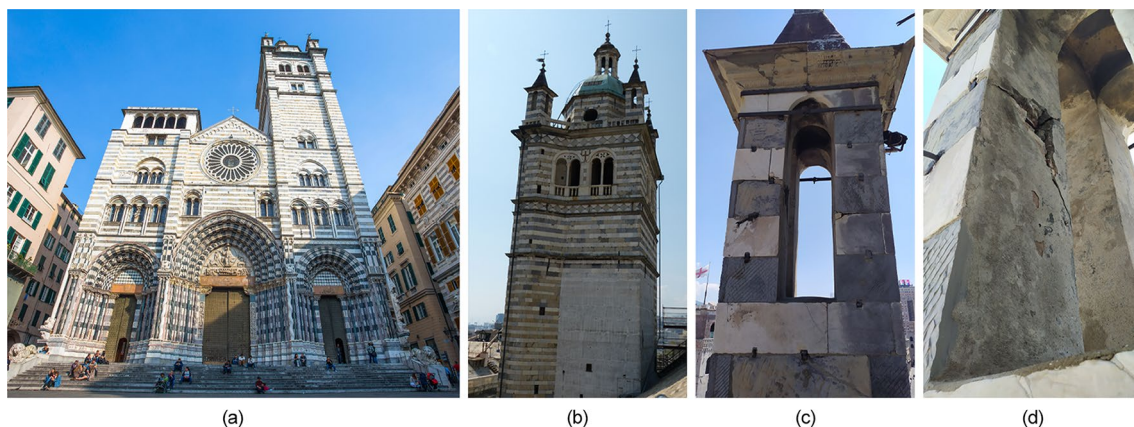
a General view of the Saint Lawrence Cathedral in Genoa; b east and north faces of the bell tower; c Northeast pinnacle on the top terrace; d detail of the crack pattern caused by the corrosion of anchoring steel elements
